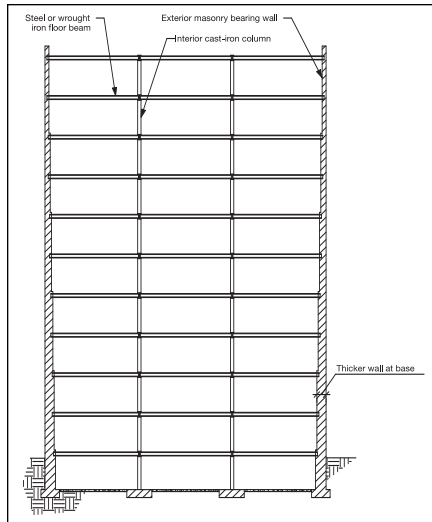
Schematic cross-section of mixed bearing-wall building. Drawing by the author.
